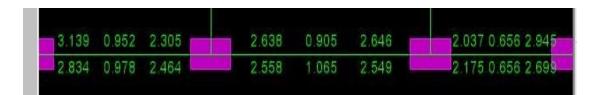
Reinforcement Area of 1ST FLOOR (Y-Axis)
